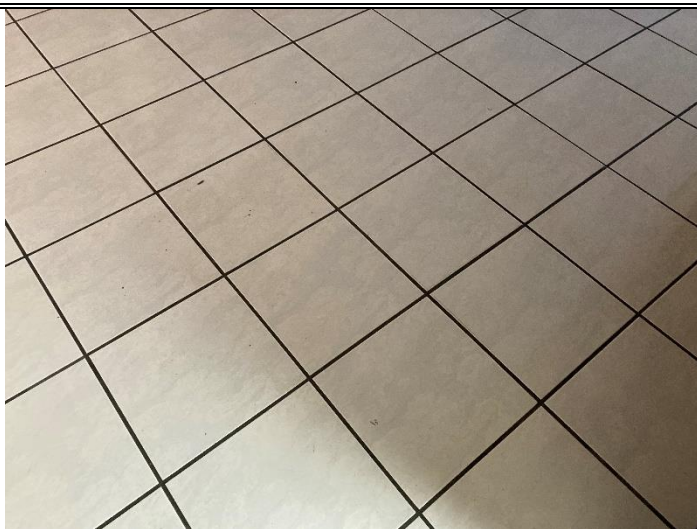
7780 HA N - 12" x 12" Floor Tile, White
